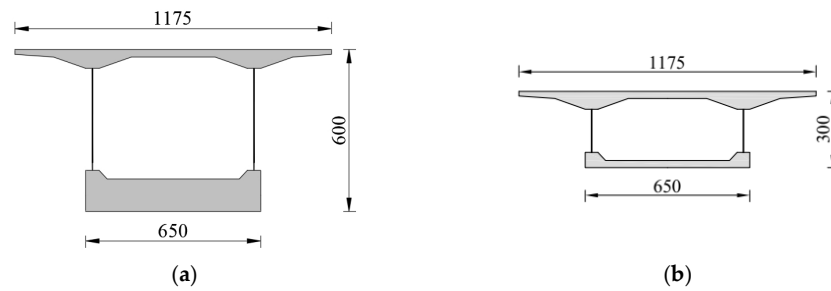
Cross-section of the composite girders with CSWs (cm): (a) position on the top of the main pier; (b) position at the midspan.
